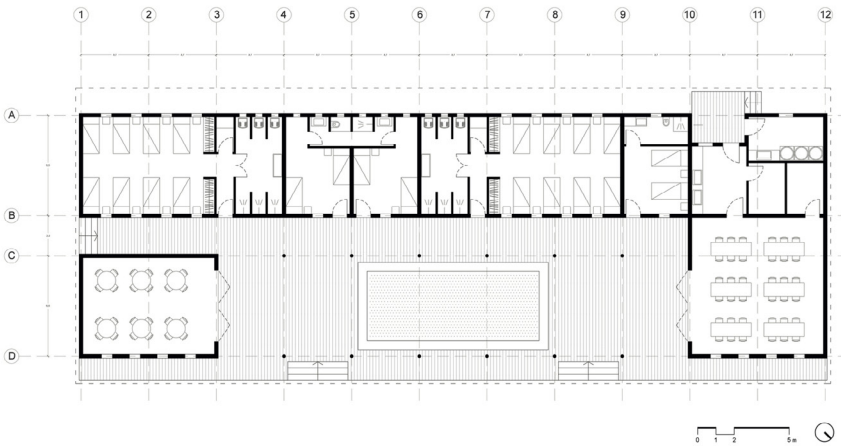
Floorplan [Aut Aut Architettura., n.d.]
